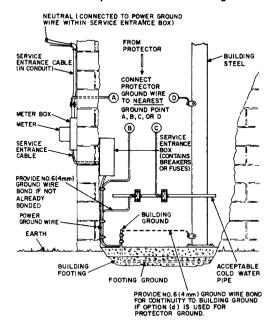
Acceptable Water System or Building Ground—Power Service Grounded to Building Footing Ground
